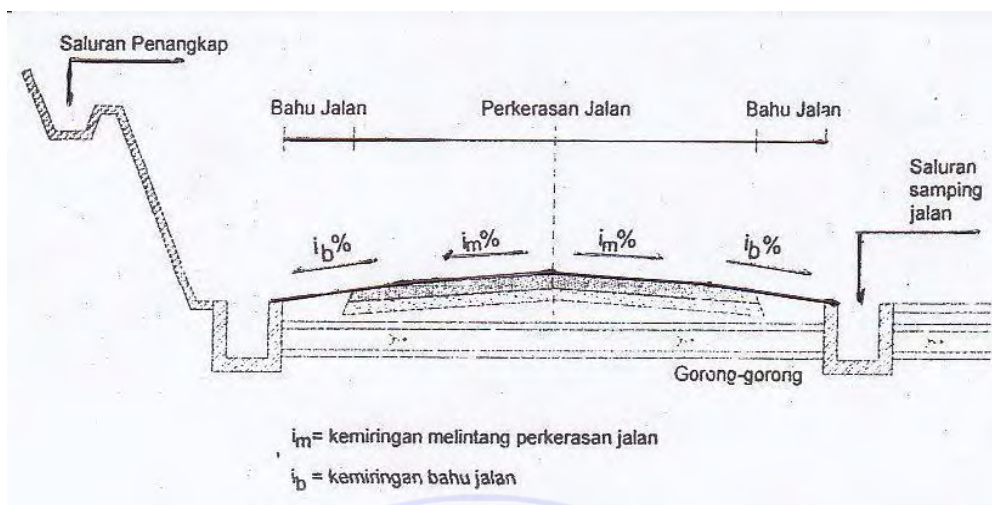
A Typical Road Drainage System With a Flow Control System from Land Slopes That Causes Dam Damage
